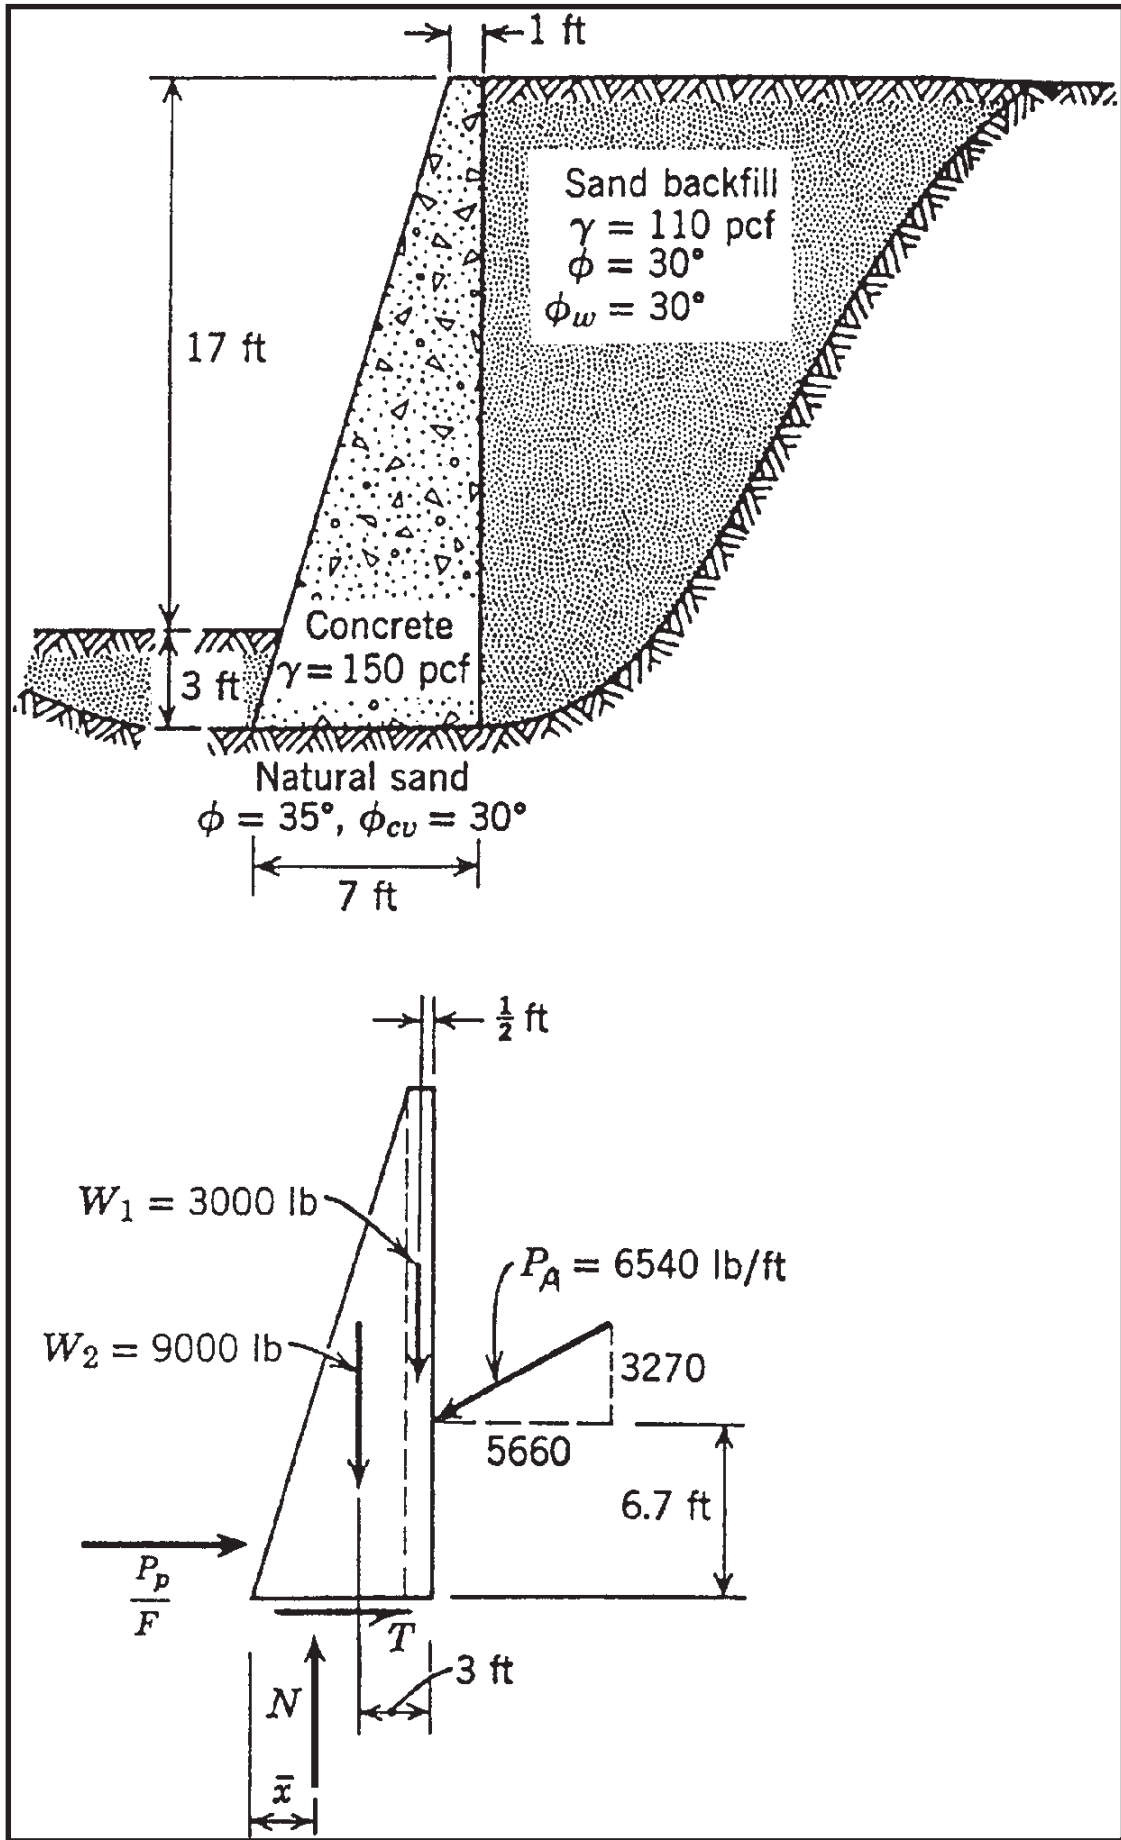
Example problem. Cross section of proposed retaining wall and resultant forces acting on the retaining wall. (From Lambe and Whitman 1969; reproduced with permission of John Wiley & Sons.)
